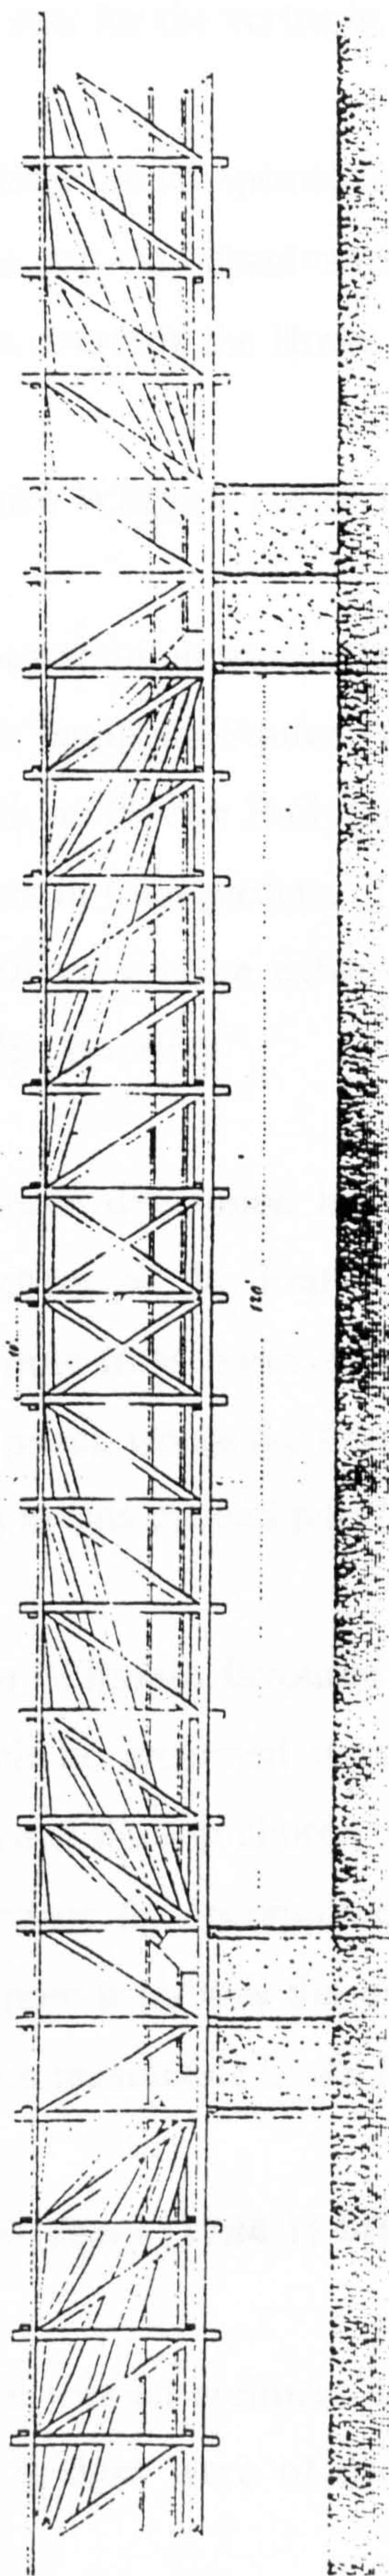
Timber bridge for Potomac River, Washington. Engineer unknown.
